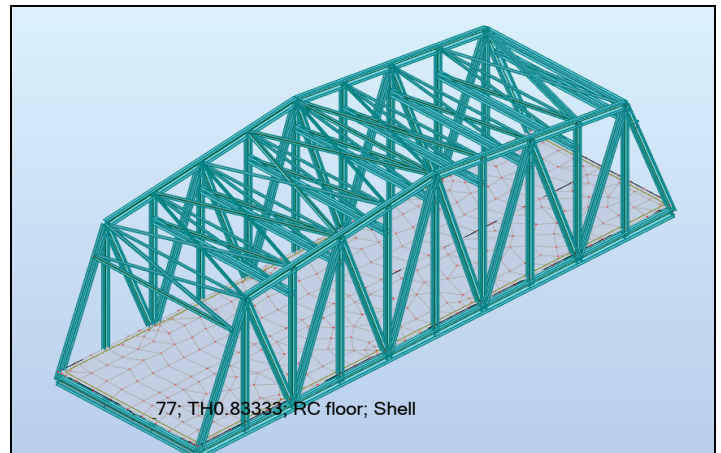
(Front View) 3-D view of Warren Truss bridge.
